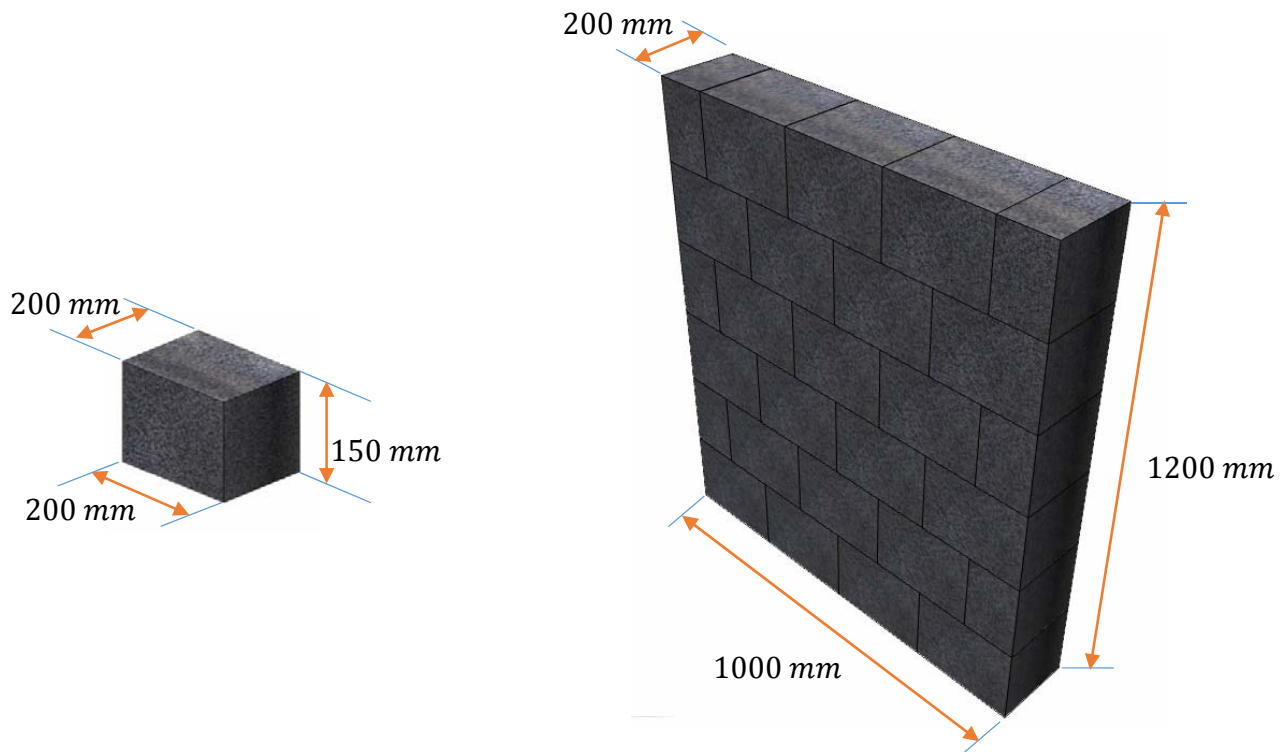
Geometry and bond details of sawn stone walls, WS; (Vasconcelos walls)
